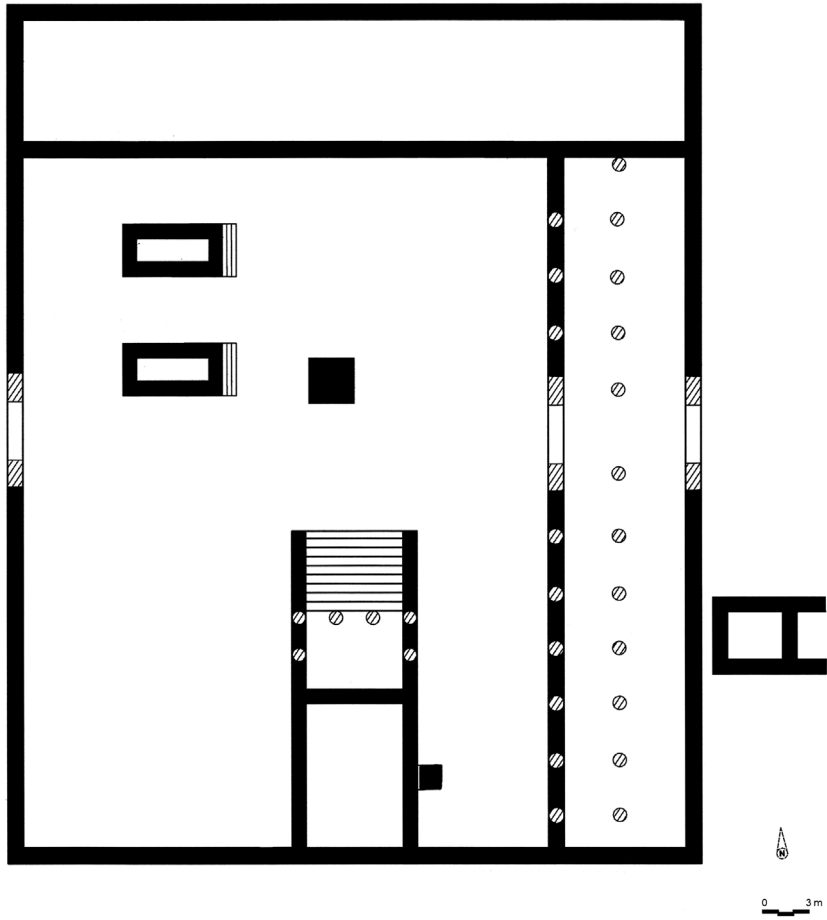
Plan of the forum at Bobadela (FRADE 2010).
